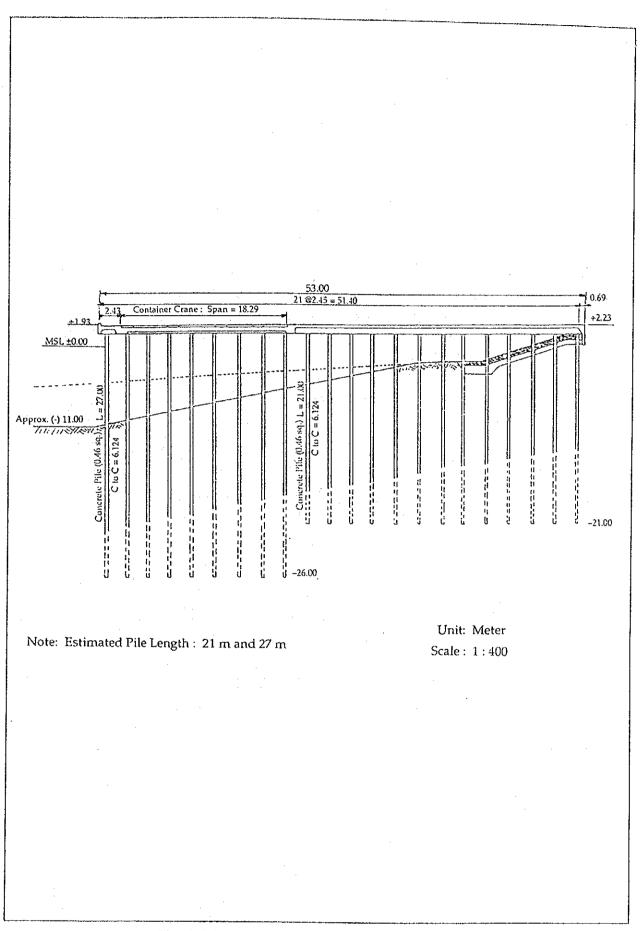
Typical Cross Section of Wharf No.5
